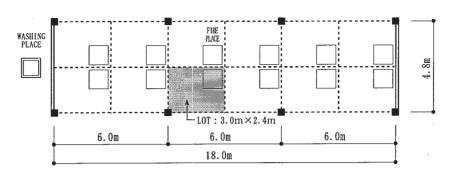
Floor Plan of Fried Fish Processing Buildings
